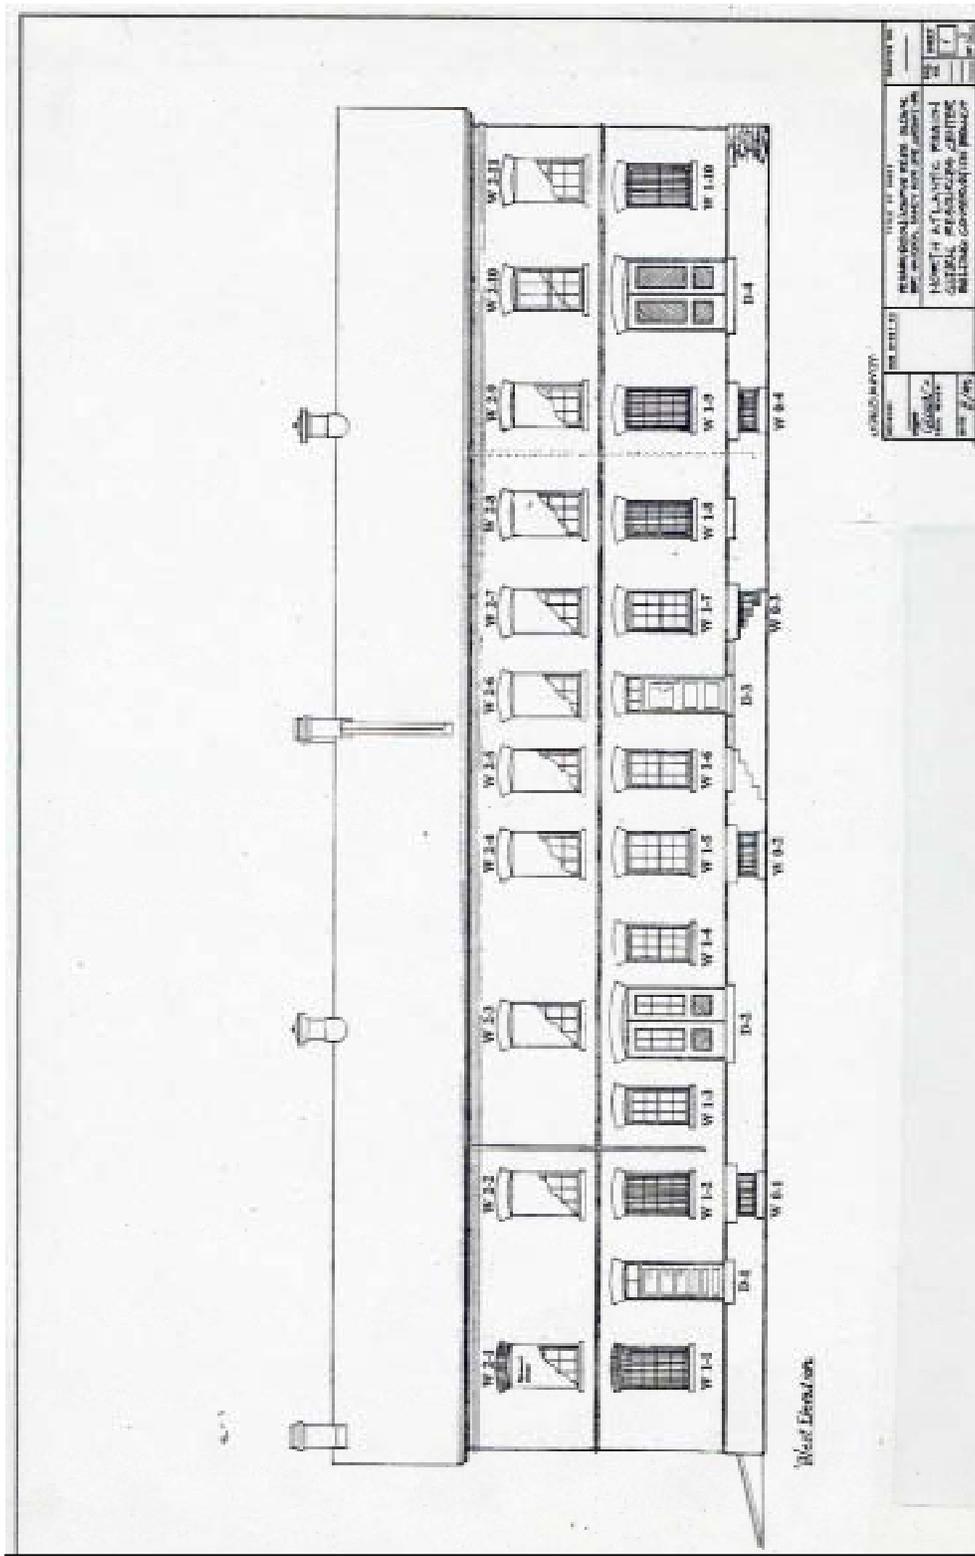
West elevation of Building 32, showing scheduled doorway and window assignments [1993].
